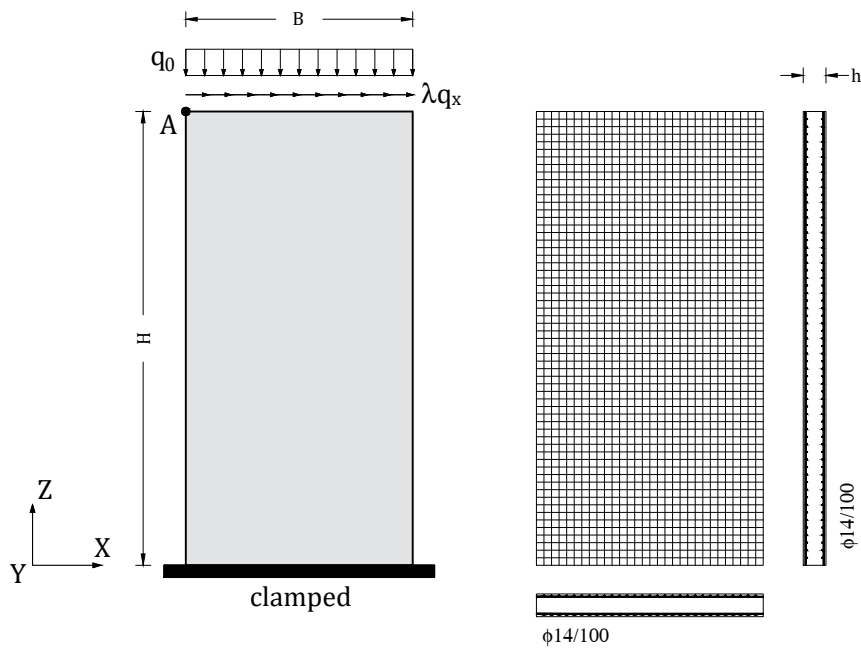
Reinforced concrete wall: geometry and boundary conditions. All lengths are in mm.
